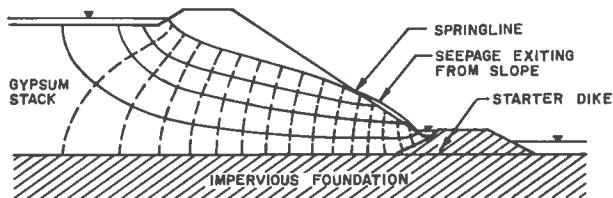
Seepage Pattern Through a Gypsum Stack on an Impervious Foundation.
